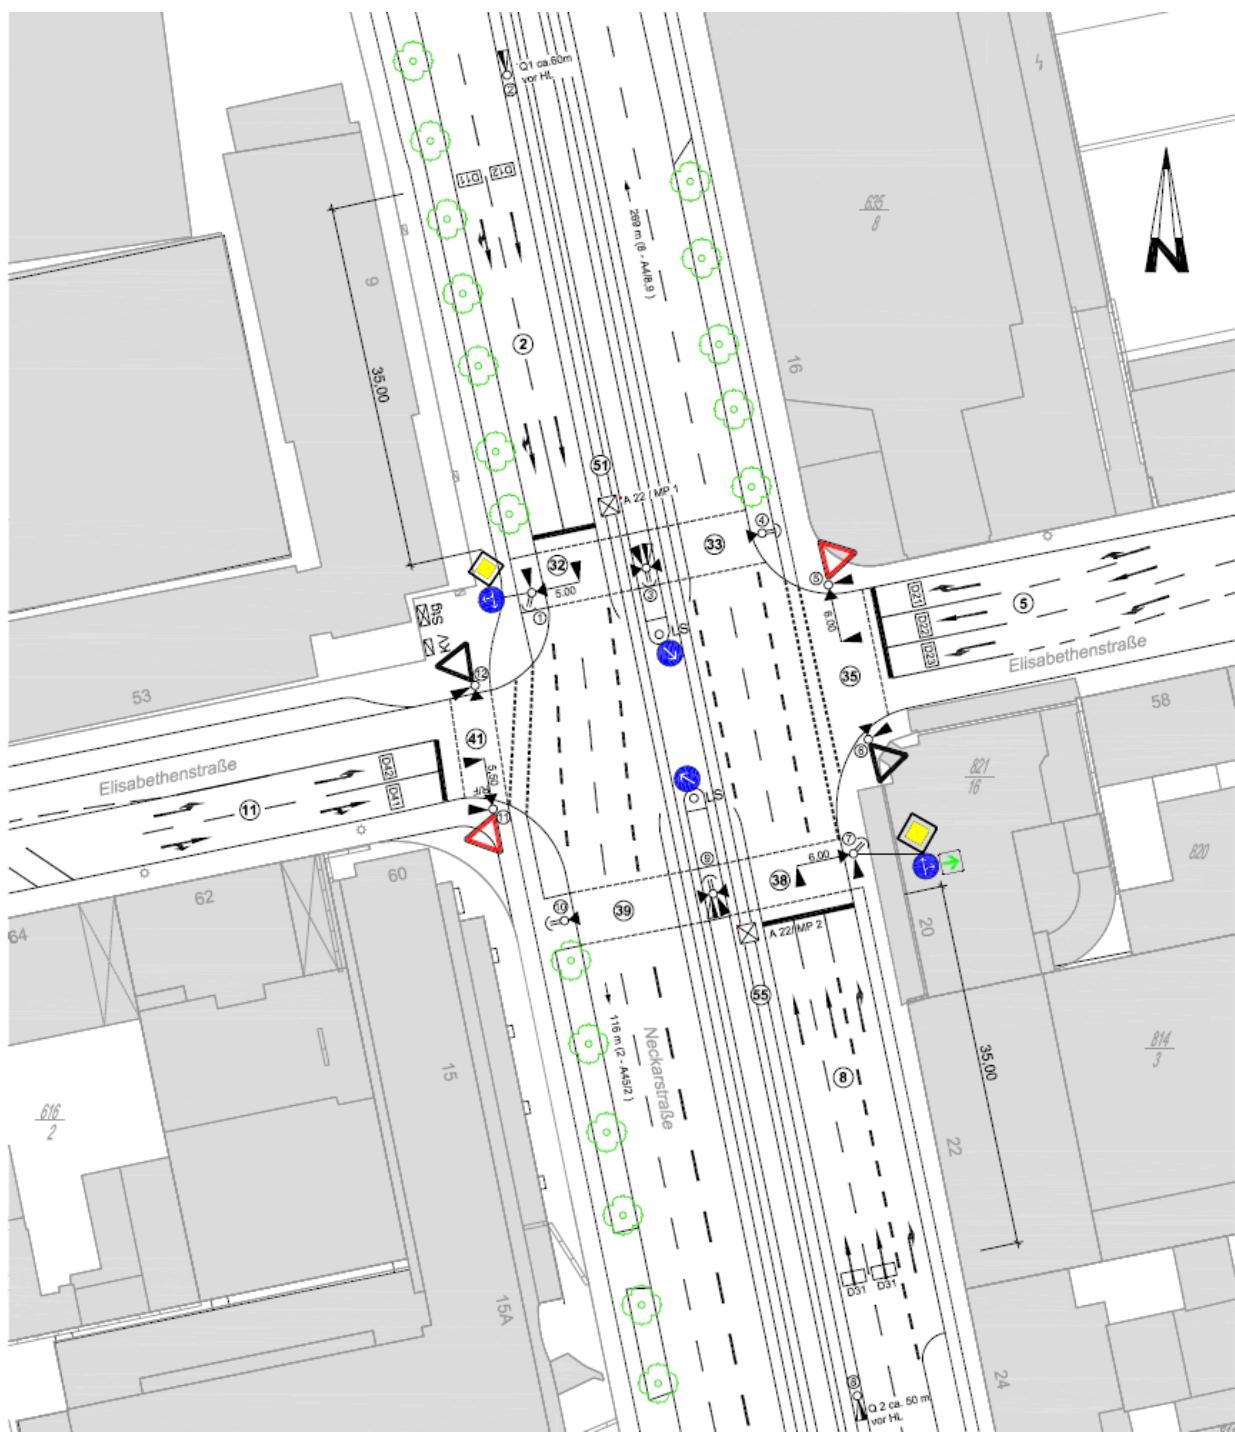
Junction Layout of A13 intersection, Darmstadt (Source: Darmstadt Town hall)
